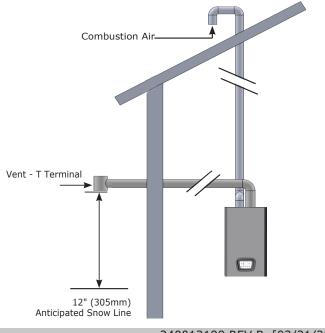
Twin Pipe Separated Horizontal Flue Termination
